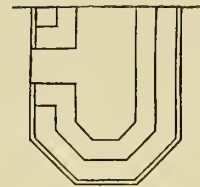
PLAN OF CONSERVATORY STAGES.
